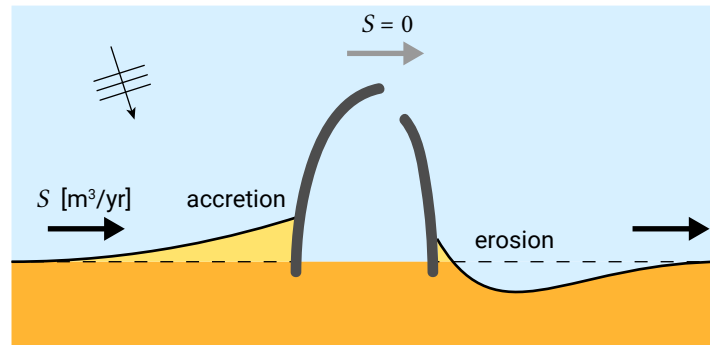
Typical structural downdrift erosion and updrift accretion.
